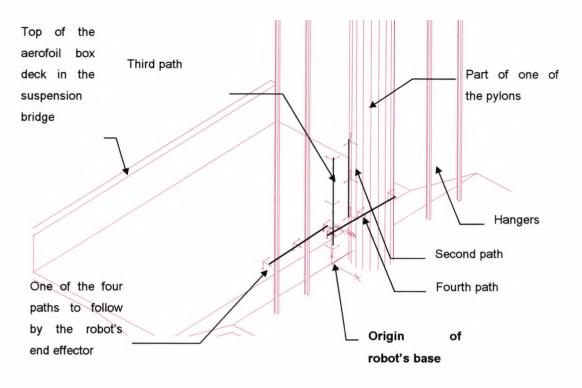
Bridge Detail [E3] according to Table 4.3
